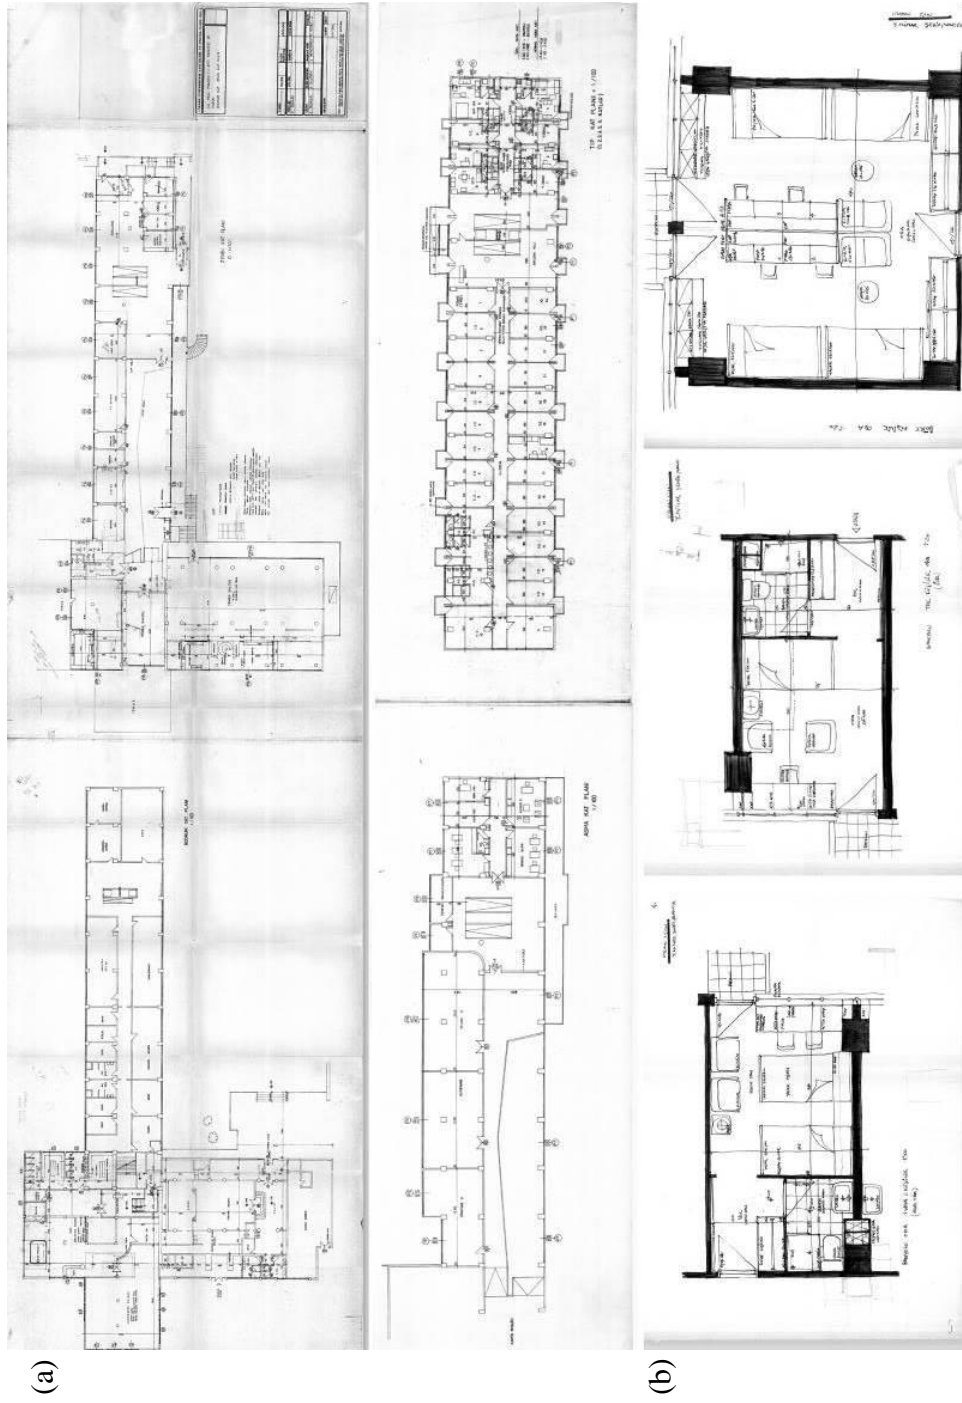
Basement, ground, mezzanine and typical floor plans of the dormitory building (a) and layout plans of dormitory rooms for one, two and four students (b) in the restoration project dated 1996 (archive of Ankara University Directorate of Construction and Technical Works)
